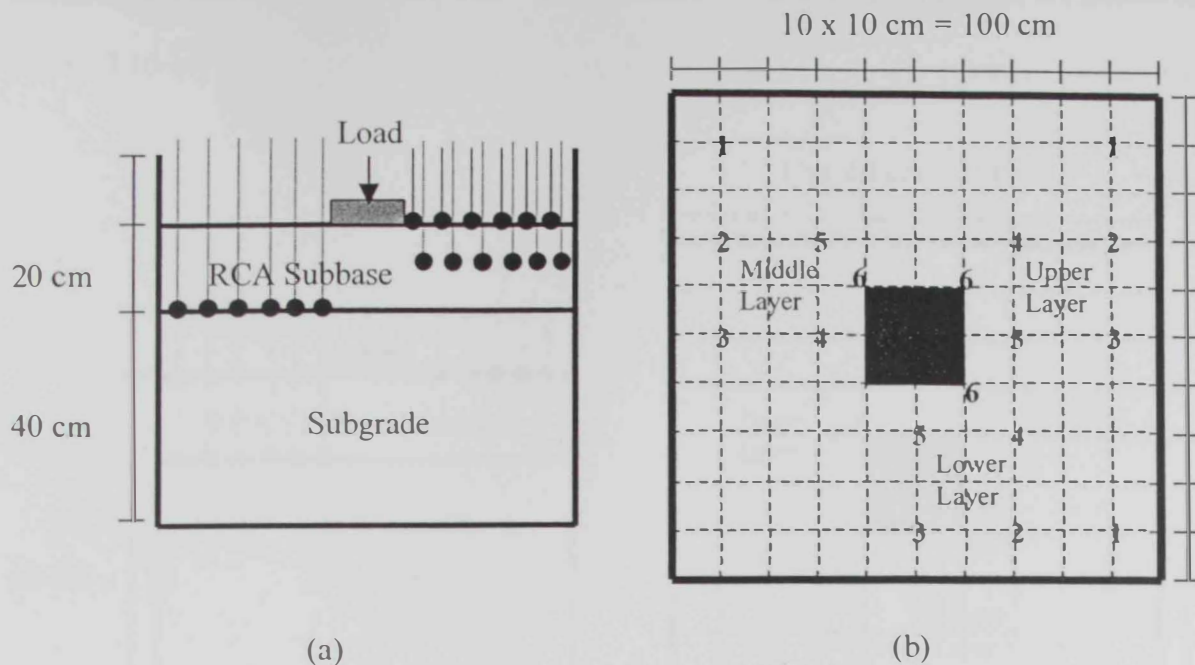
Model Description- Experimental Setting IV: (a) Side View for the Layer Thicknesses and Material Types, (b) Top View of the Gauges Location
